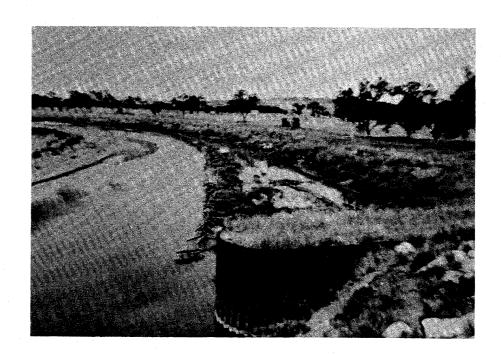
Steel sheet-pile spur (wing dam) upstream from bridge. Kellner jack field along bankline beyond spur. (Grand River, S. Dak., Site 175; photograph from South Dakota Dept. of Transportation.)
